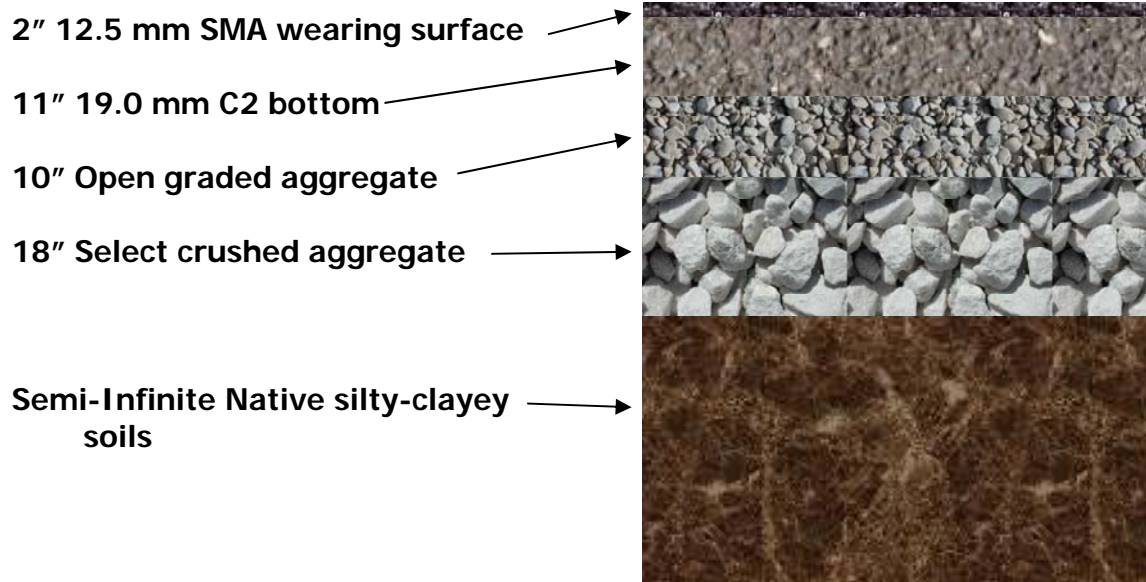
Pavement Structure Used for EVERSTRESS Analysis
